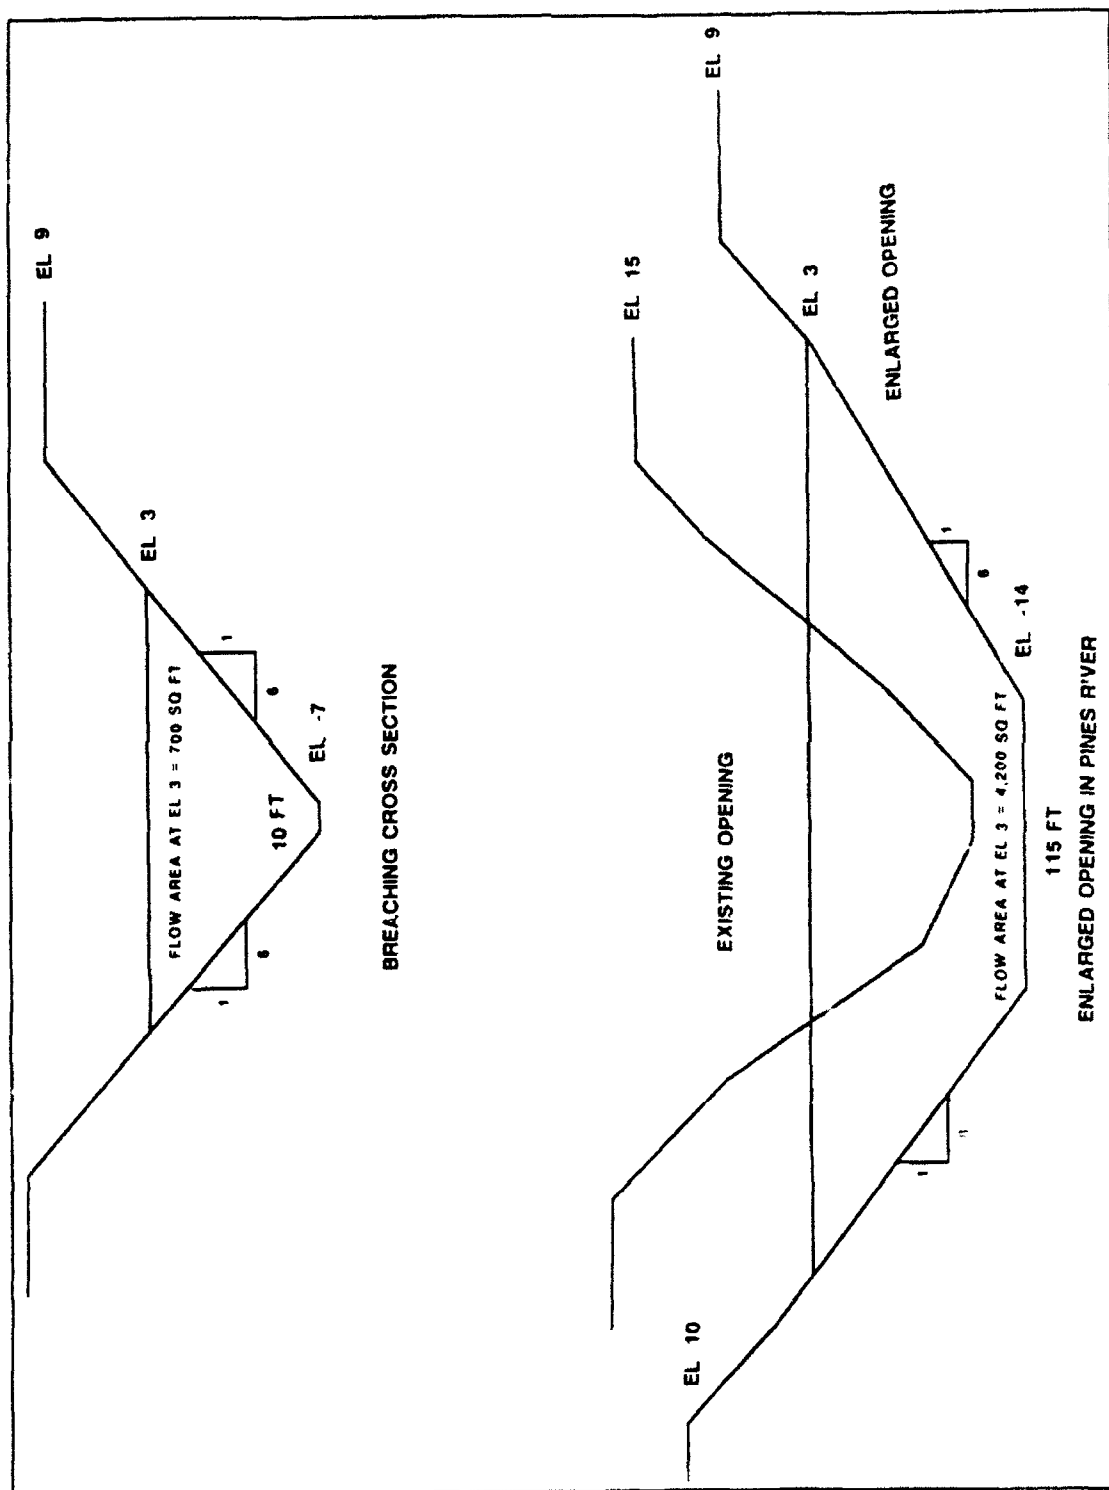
Dimensions of breaching cross section and enlarged opening in Pines River
